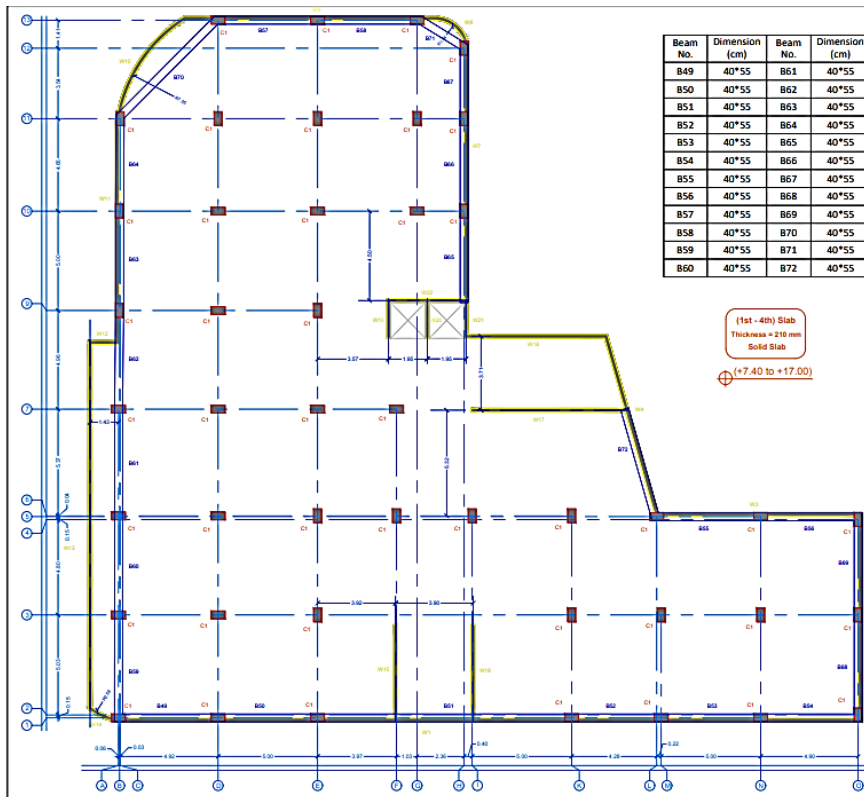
Typical (1st – 4th) slab layout and beams distribution.
